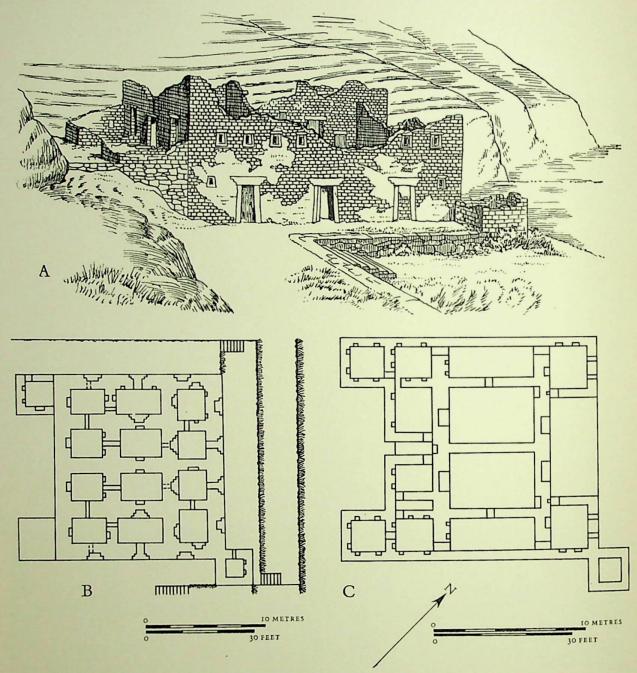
Titicaca Island, Palace, late fifteenth century. (A) Condition in 1870; (B) Plan of ground floor; (c) Plan of upper storey
